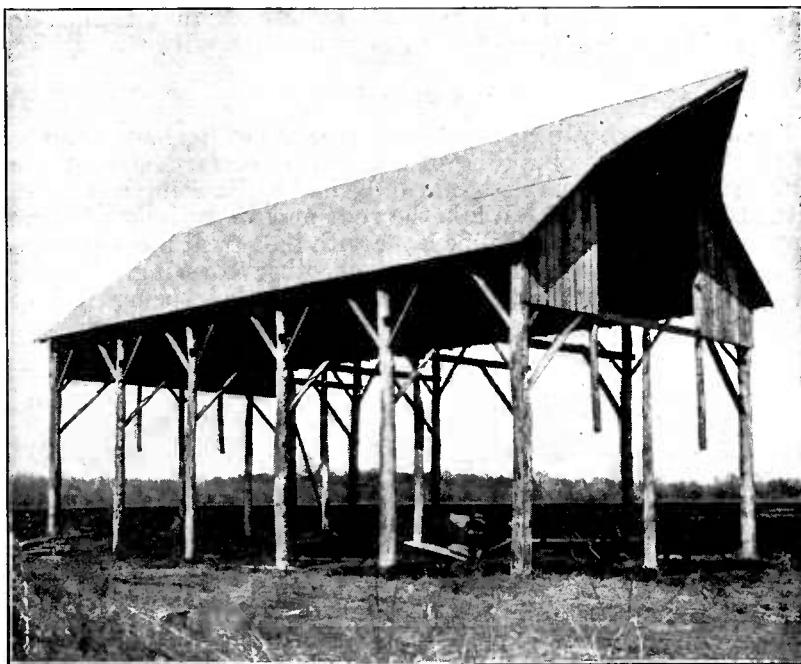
Hay shed 24 by 60 feet; posts are 12-inch logs 25 feet long. The roof could well be of slabs and these could be used to close-in the sides. Knee braces of 5-inch and girders of 10-inch diameter logs could be used instead of the dimensioned lumber.
